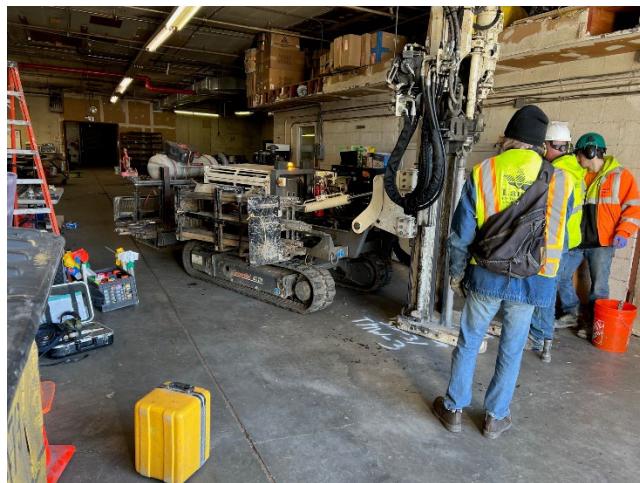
Drilling at SB-3/TMW-3 in the southwest corner of the Building.
